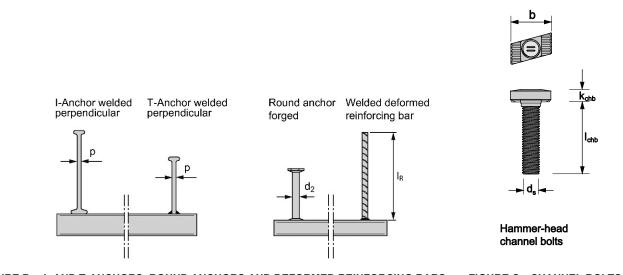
FIGURE B— I- AND T-ANCHORS, ROUND ANCHORS AND DEFORMED REINFORCING BARS FIGURE
